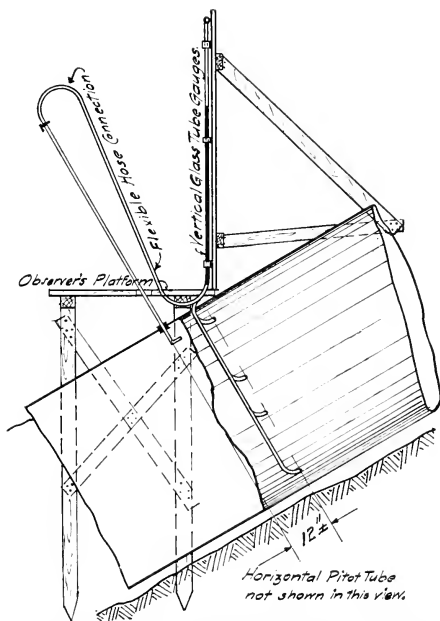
Section and Elevation of Gauge Board, Penstock, Pressure Tubes and Pitot Tubes.
